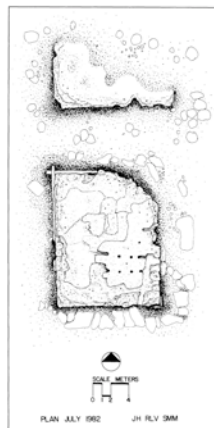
Plan of the two constructions belonging to a breakwater and a tower in Caesarea Maritima.
